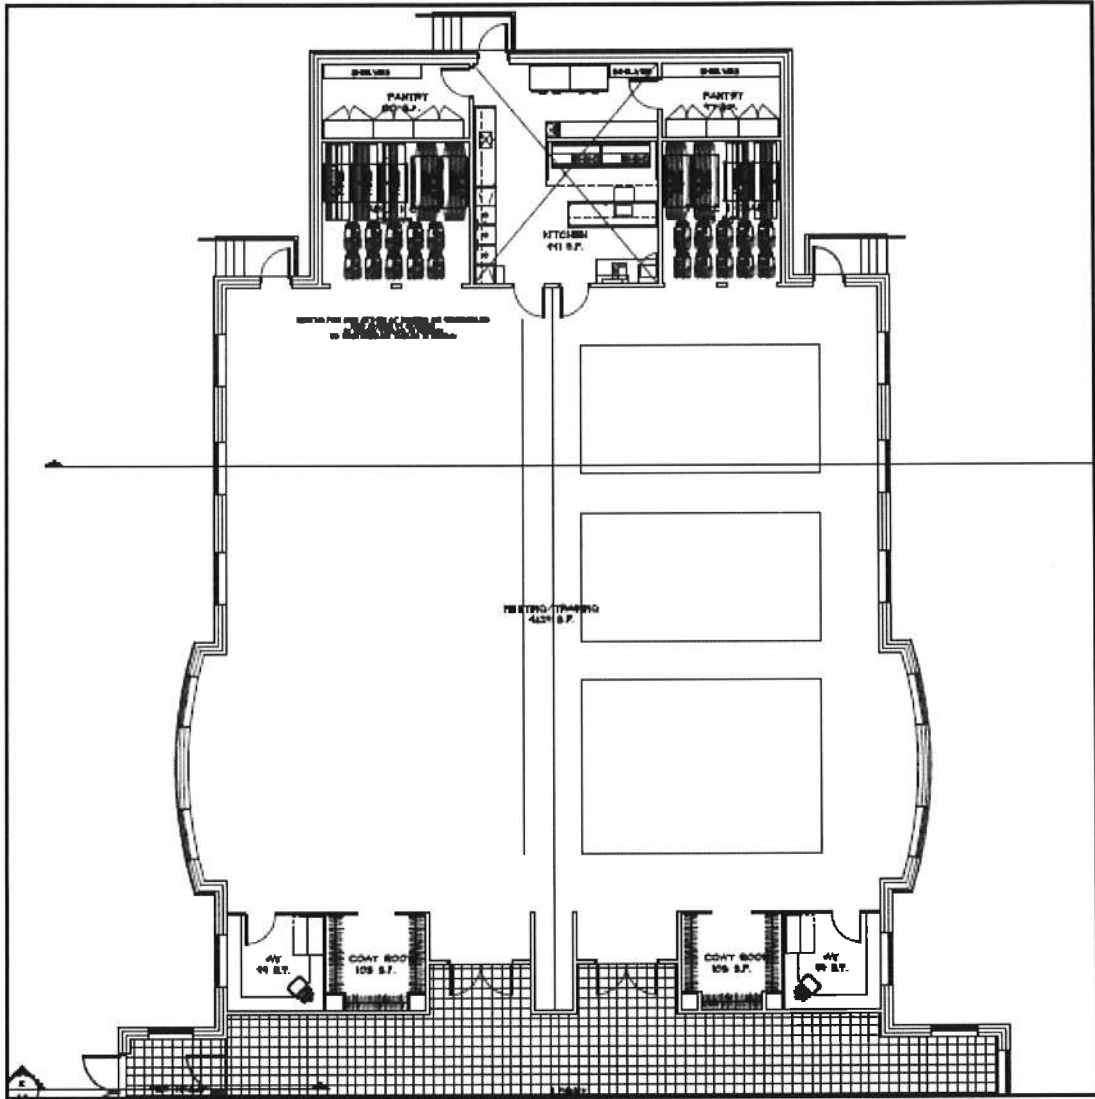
Illustrative First Floor Plan (Western Main Street)
